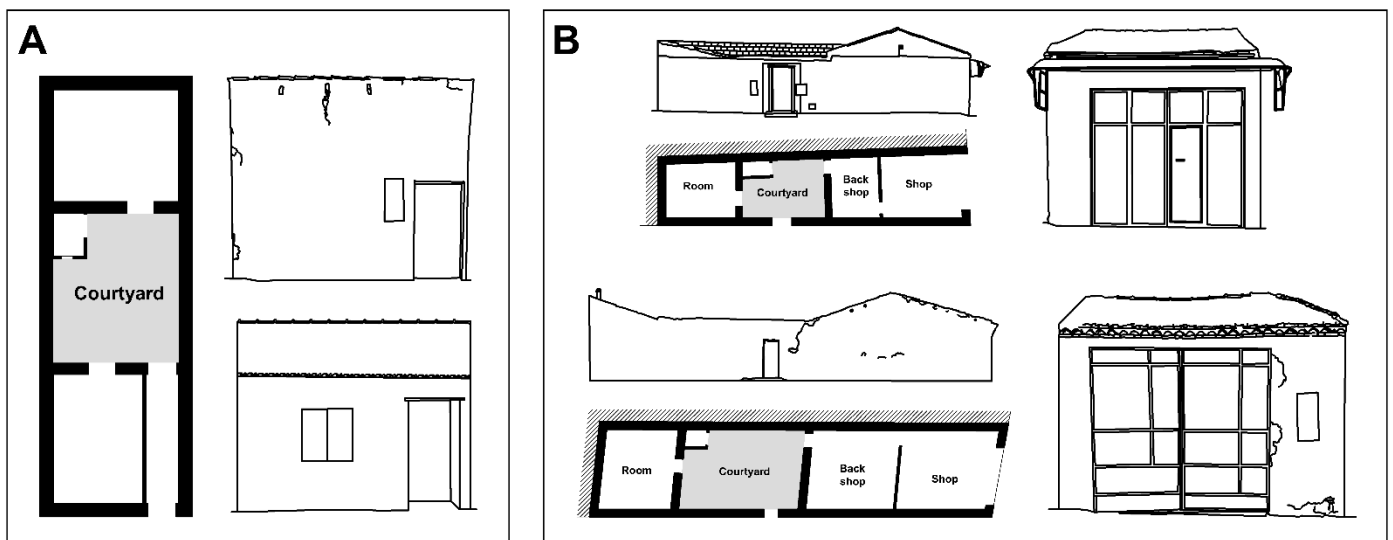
Legibility of planimetric organisation at elevation level. (Source: Authors, 2024)
